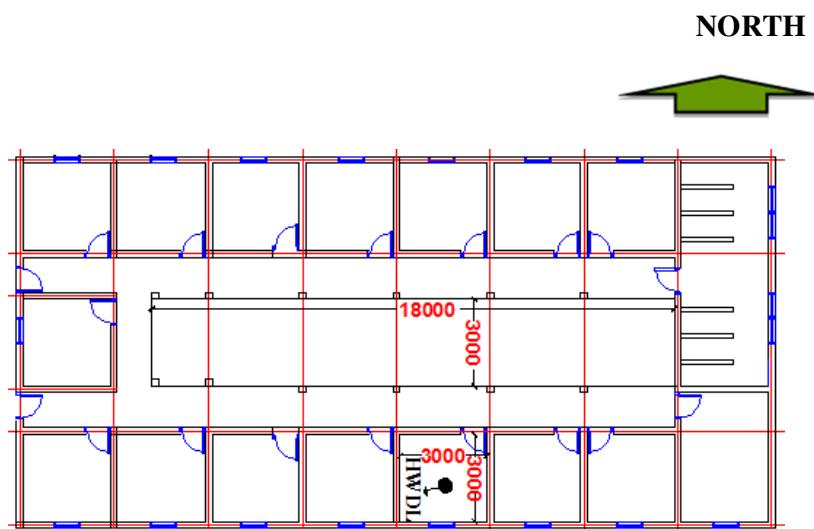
Floor Plan of the fully enclosed Courtyard House (case-study 2)
